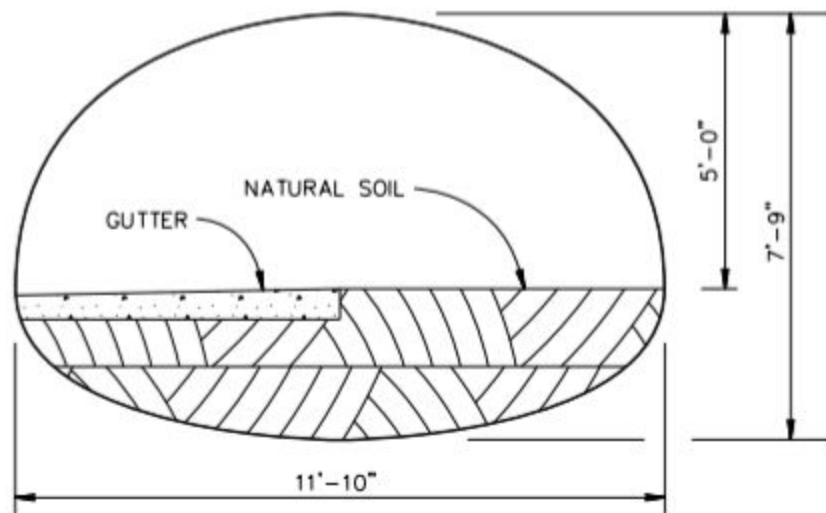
Cross-section of Alternative 2: Corrugated Steel Pipe.
